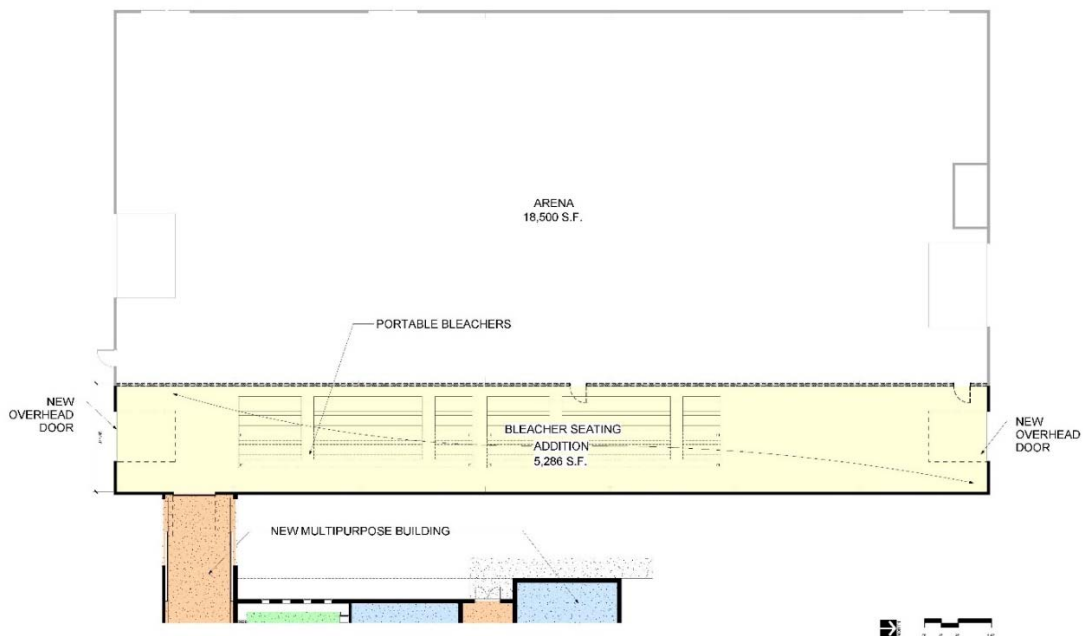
Proposed Indoor Arena Spectator Seating Addition
